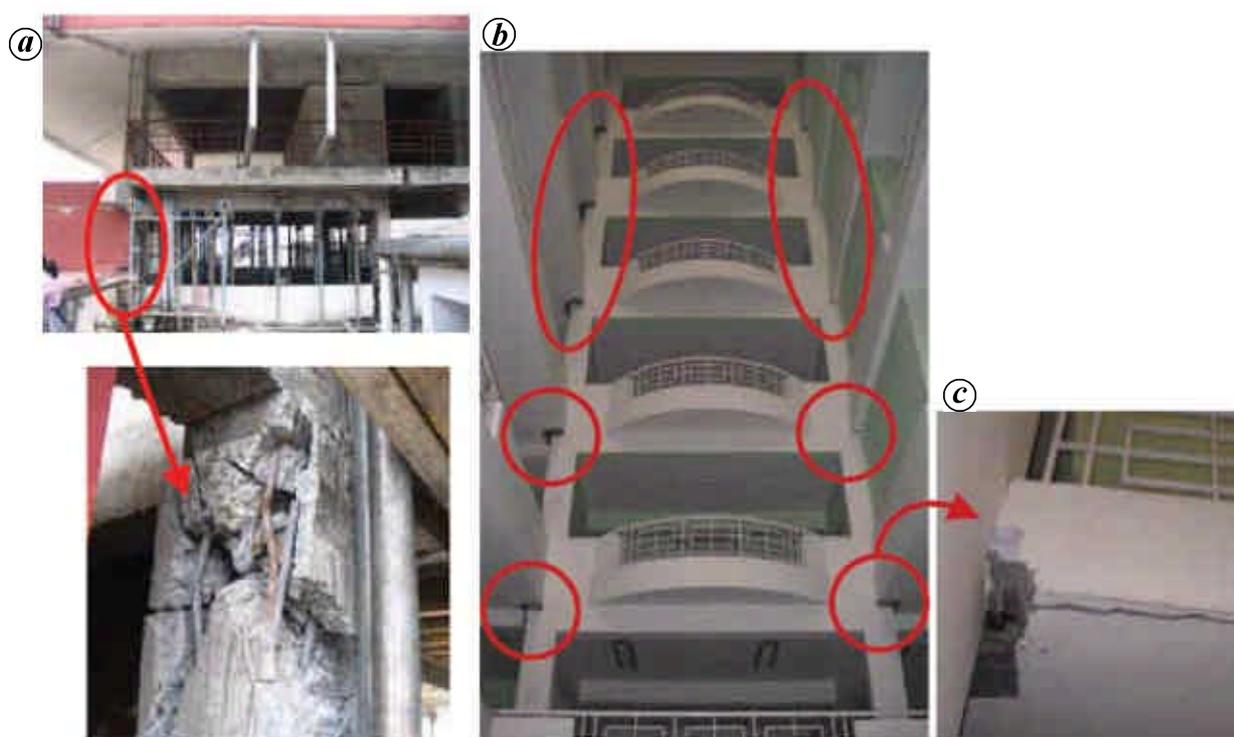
Damages in nine-storey RC hostel building (SMIMS). *a*, Damaged RC column supporting water tank on the roof. *b* and *c*, Pounding damages at the ends of the two wings took place at all the floor levels.
